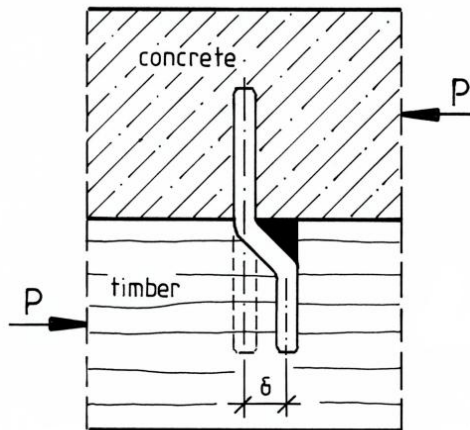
Timber concrete dowel connection failure. (Adopted from (Aicher, et al., 2003) )
